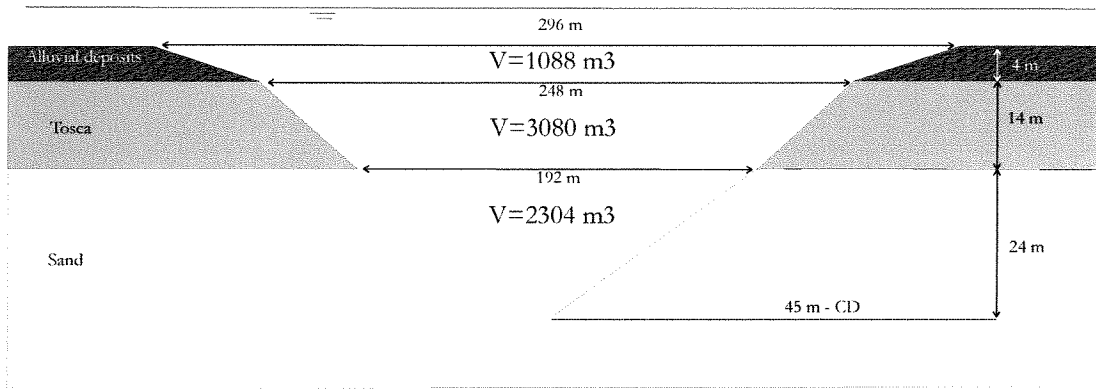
Cross section of smallest possible pit with depth of 45 m
